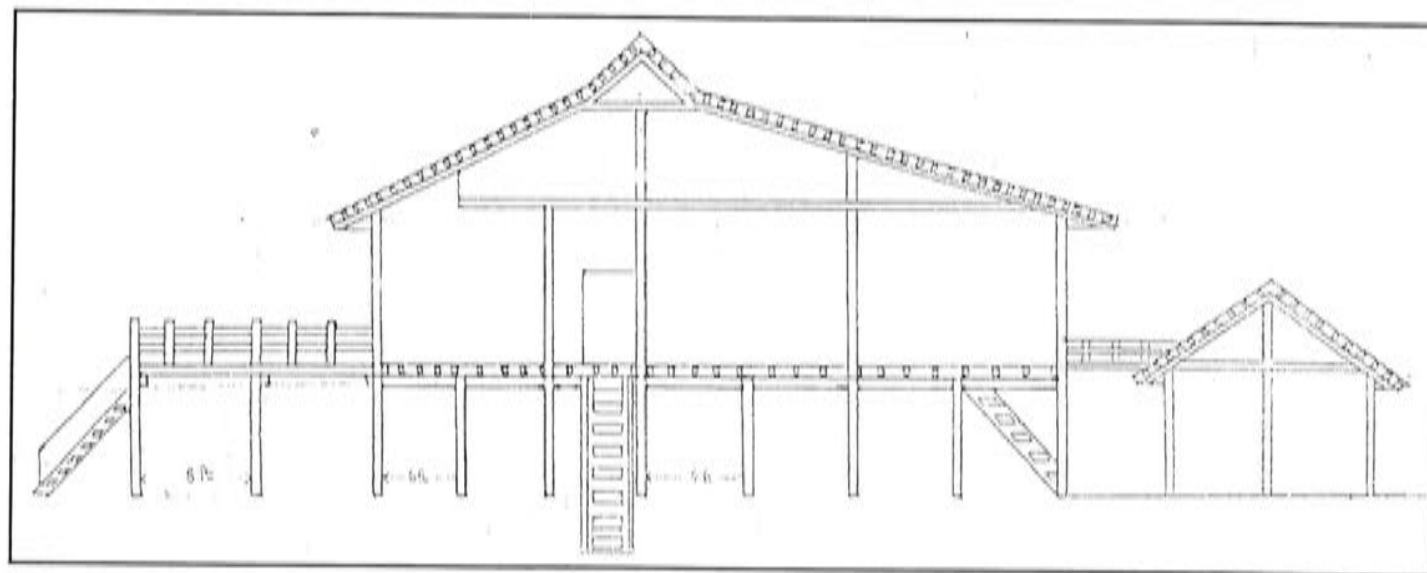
Sketch-plan showing cross-section of proposed Stamang 'tourist' longhouse.
